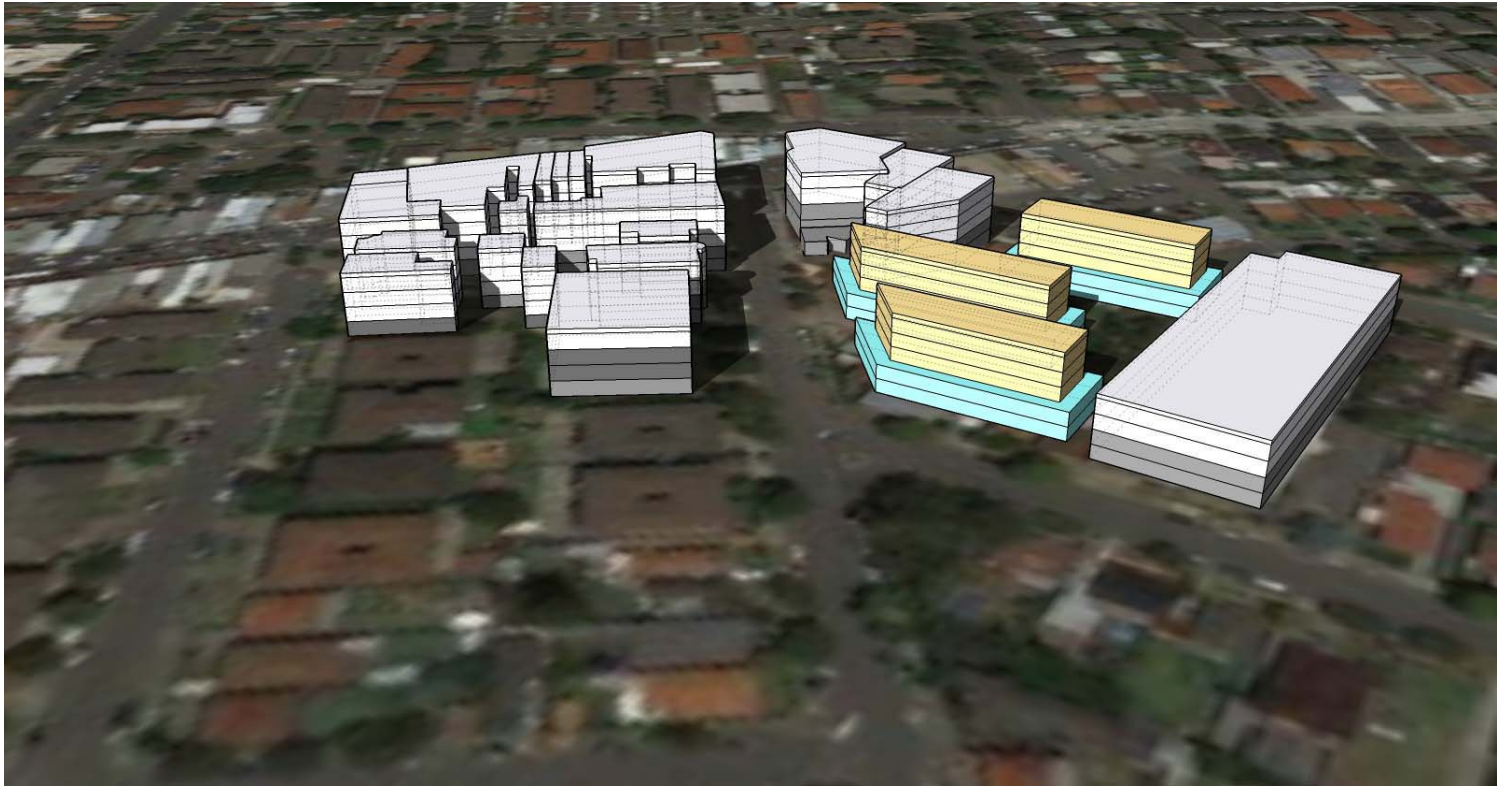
Northern view of Bexley Town Centre built to existing maximum height, FSR, and preferred development outcome for subject site.
